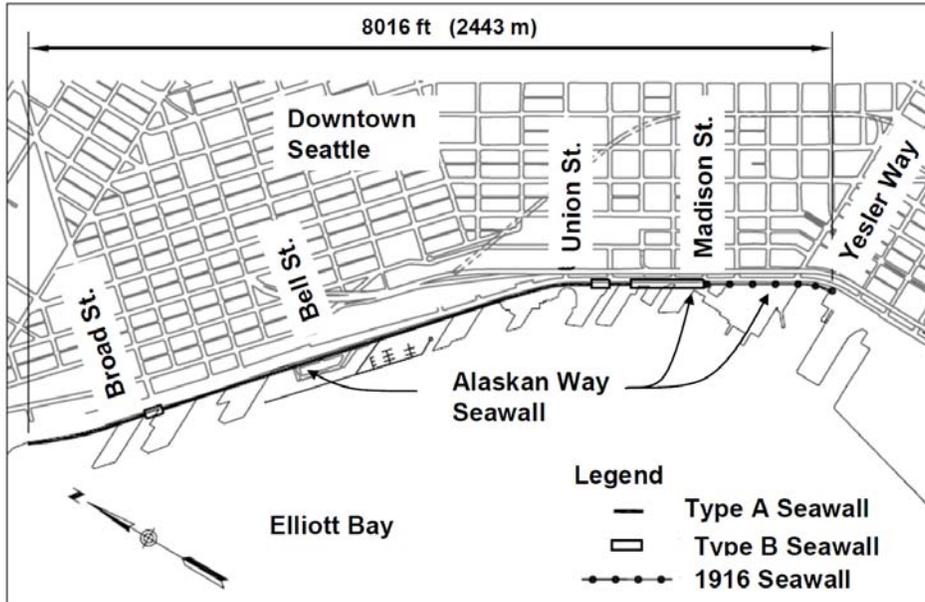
Plan of Seattle waterfront showing the Alaskan Way Seawall.
